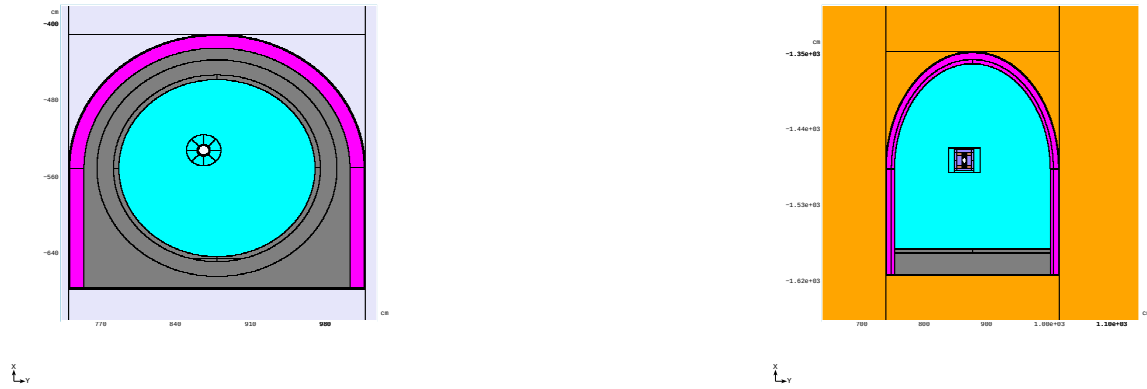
Transverse cross section of NuMI tunnel in carrier tunnel 177 m and at 237 m).
